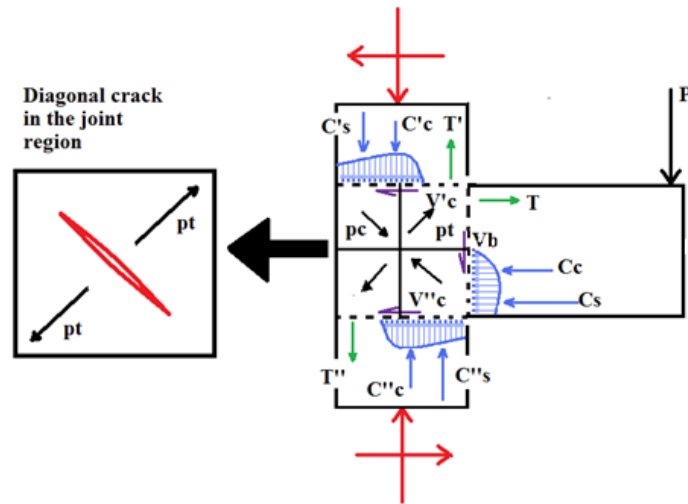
Diagonal Crack in Beam-Column Joints
